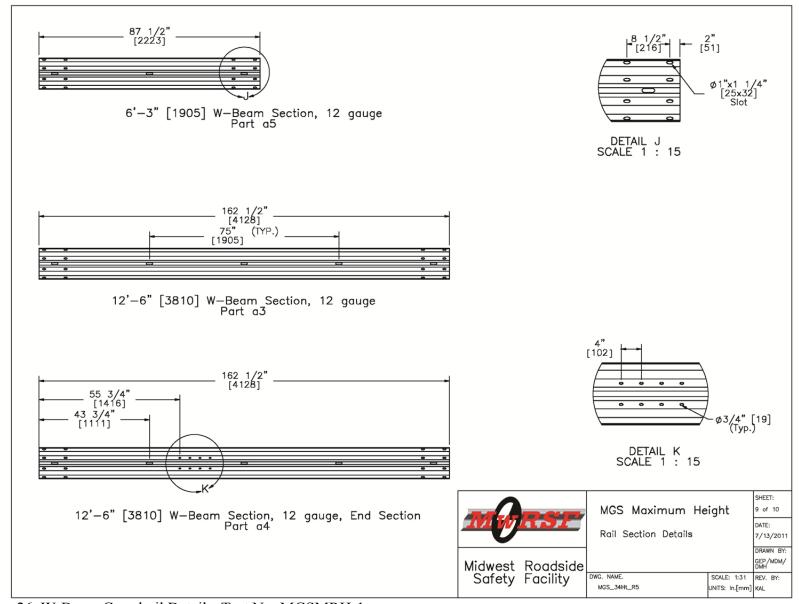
W-Beam Guardrail Details, Test No. MGSMRH-1
